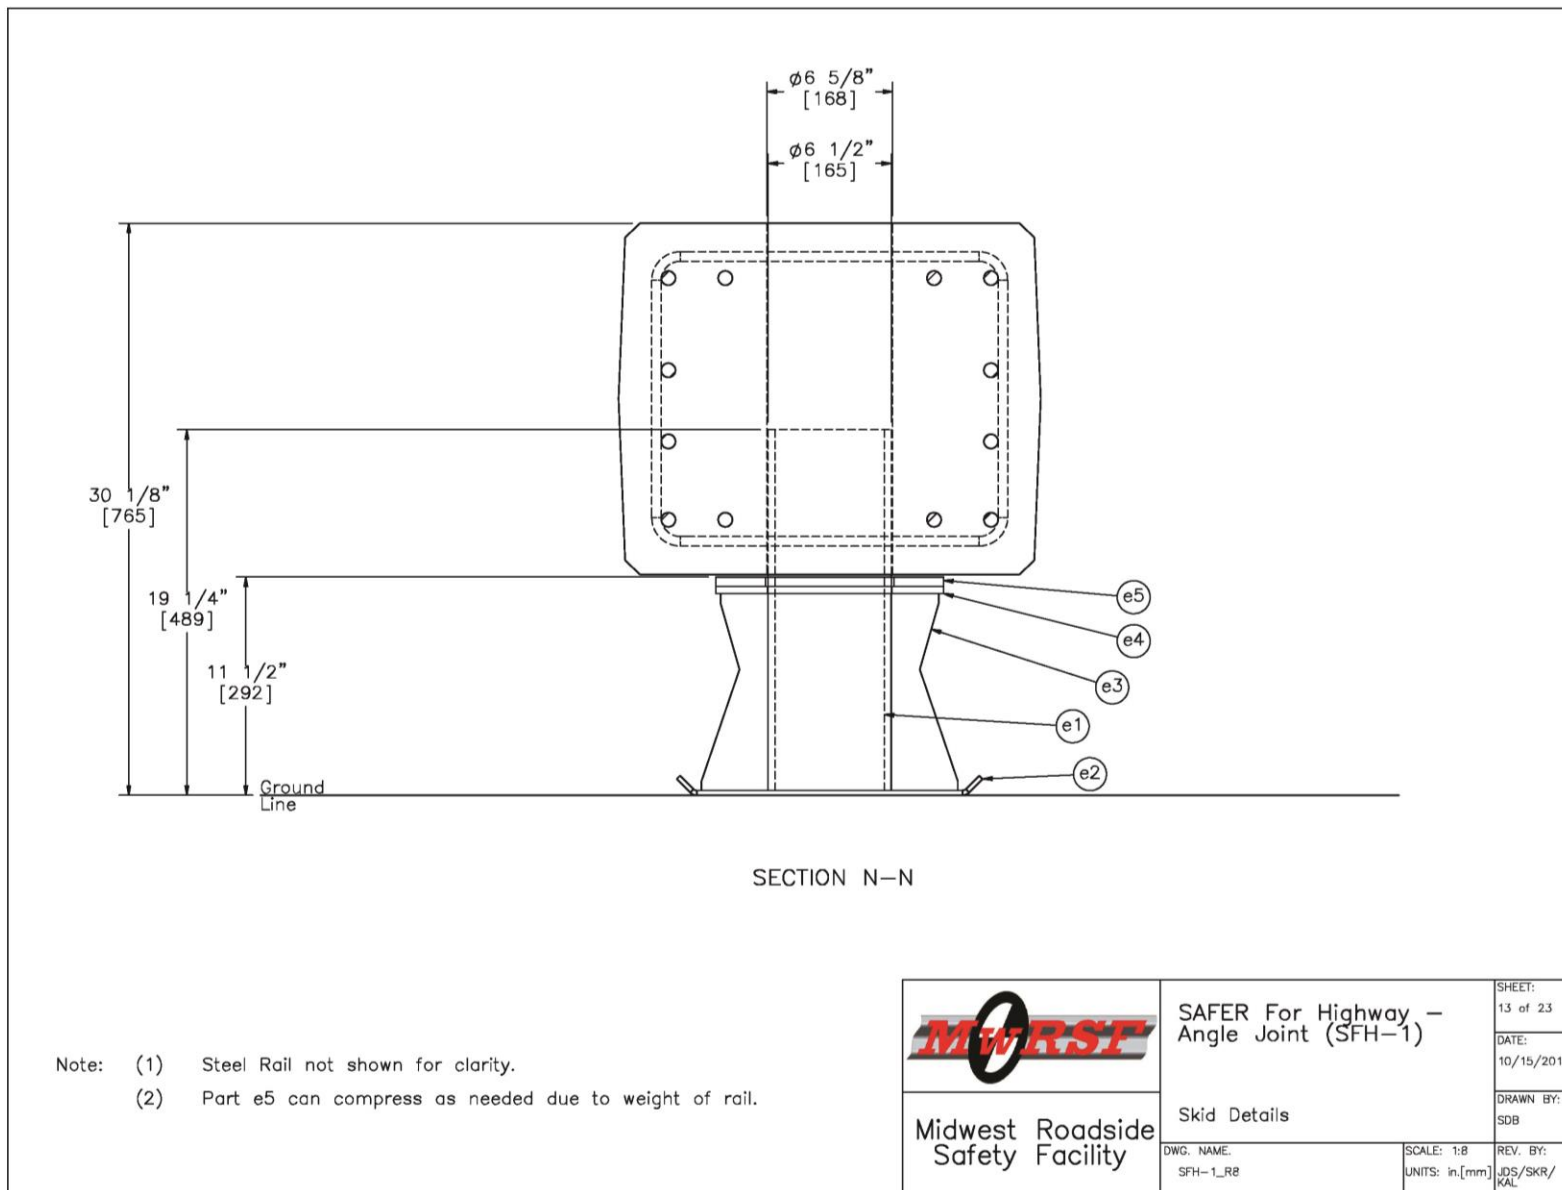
Recommended Barrier Design for Full-Scale Crash Testing, Skid Details
